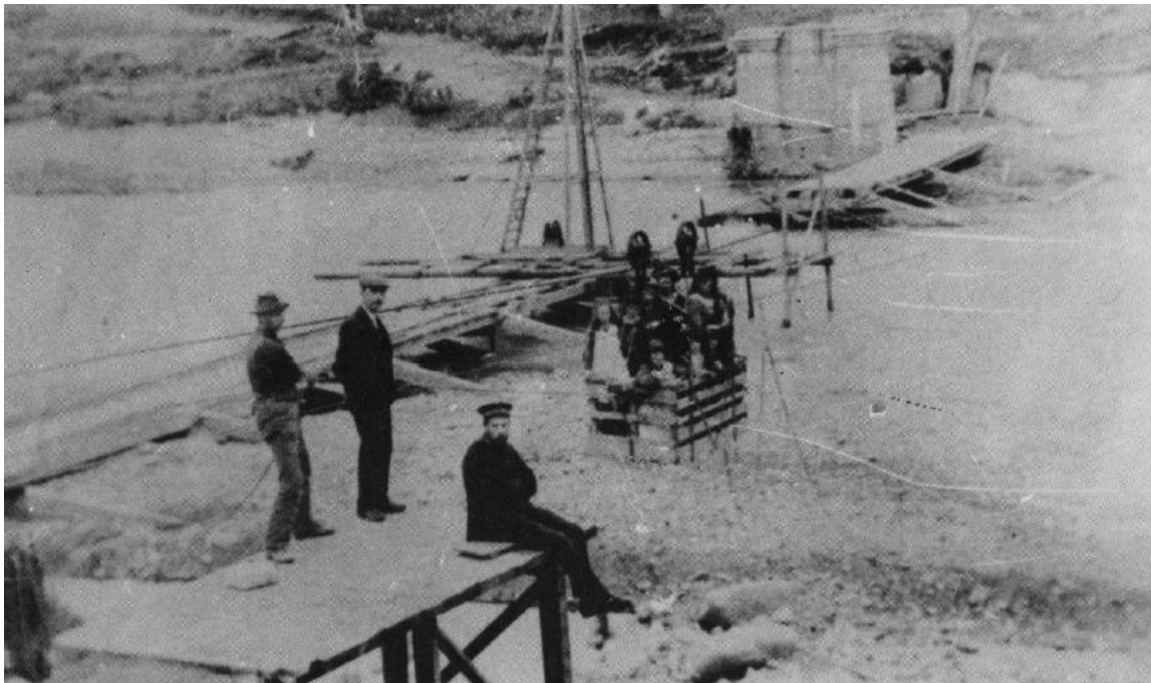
Photo showing the cage crossing with partially washed out low-level bridge and eastern pier for permanent bridge in background. Note also structure mid-stream for the placement of the central bridge cylinder (reproduced from Burr 2017)
